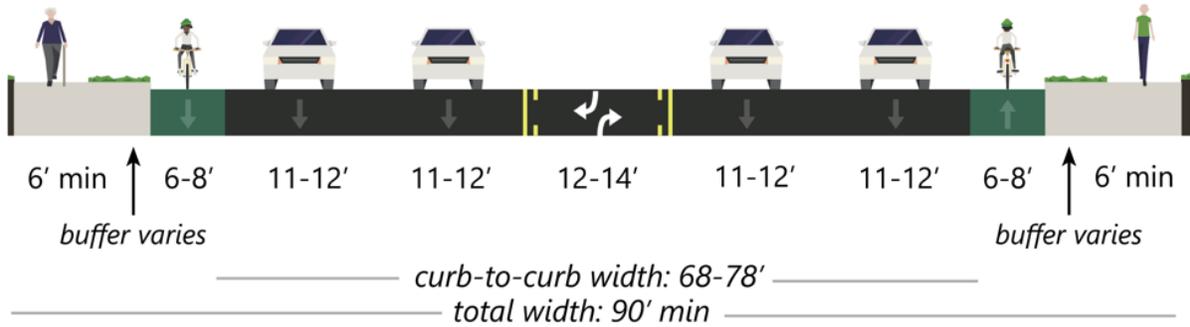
ALTERNATIVE CROSS SECTIONS – EAST: I-5 OVERPASS TO STEPHENS STREET
